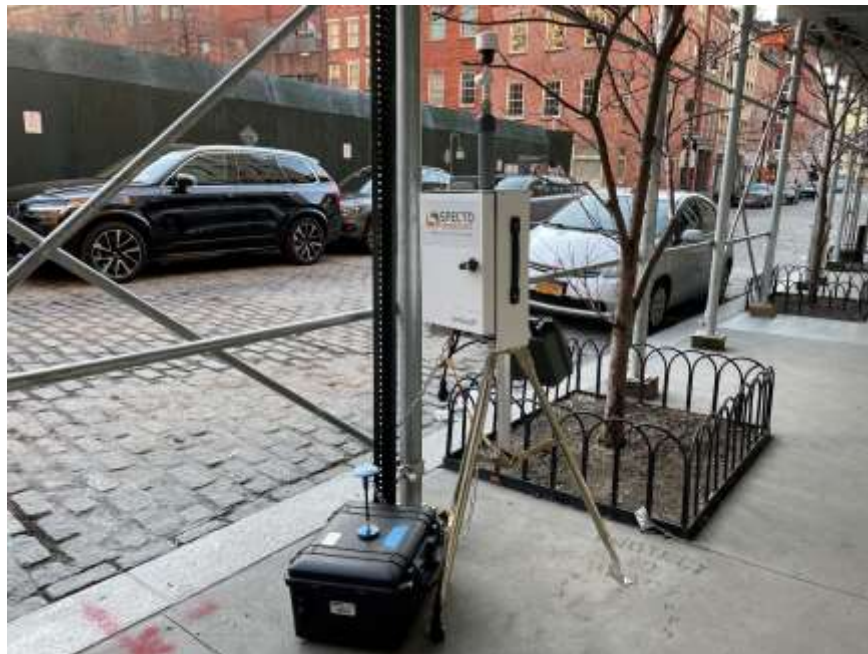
Off-site CAMP station WZ-2 placed on the western sidewalk of Beekman Street (facing southeast)
